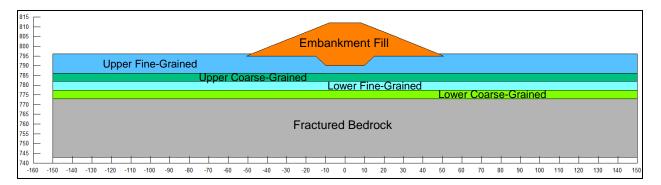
Eagle Creek Dam Section – 16-Foot Height
